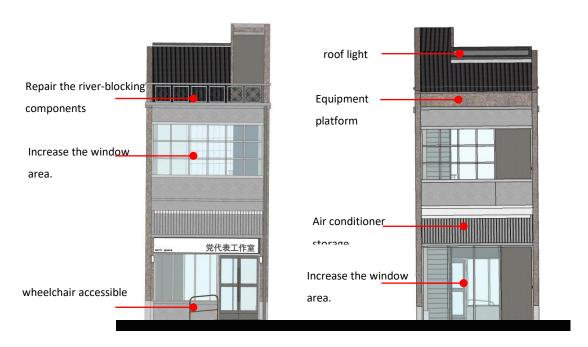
Front and back elevations Source: Author's own drawing
